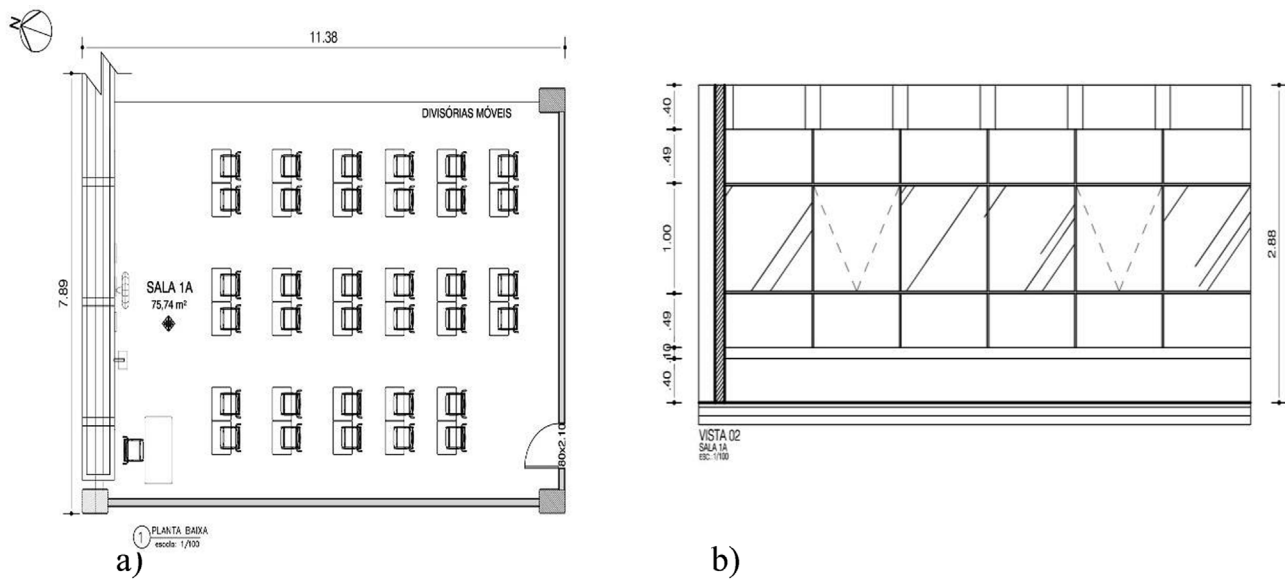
(a) Floor plan of classroom B, and (b) Frontal view of the windows.
